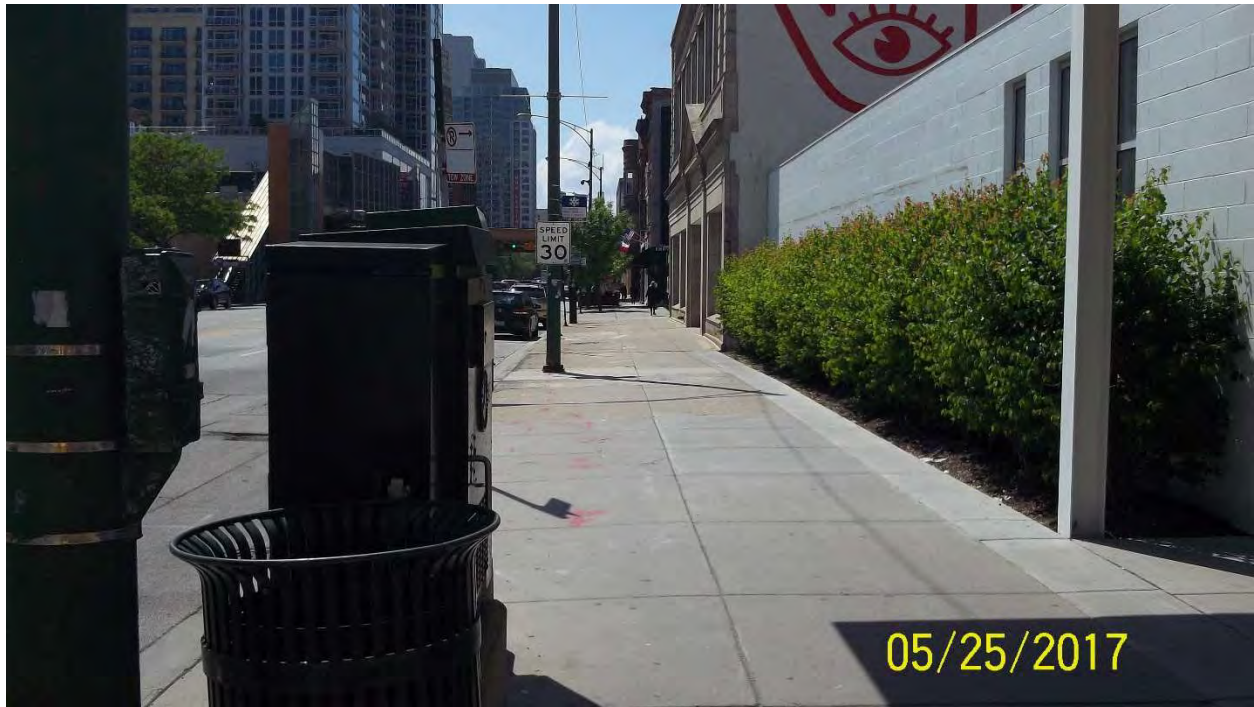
Northwest corner of Chicago Ave. / Wells St. – Looking West
